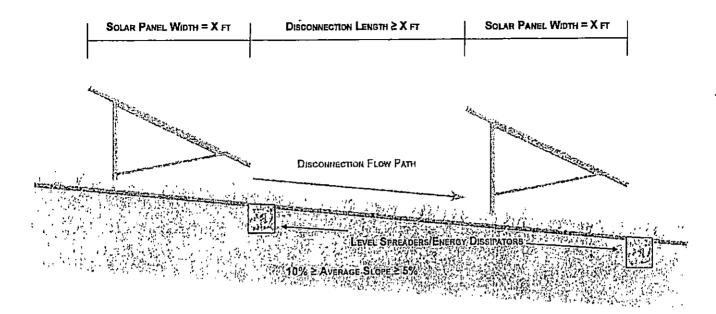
Typical Installation - Slope ≥ 5% but ≤ 10%
